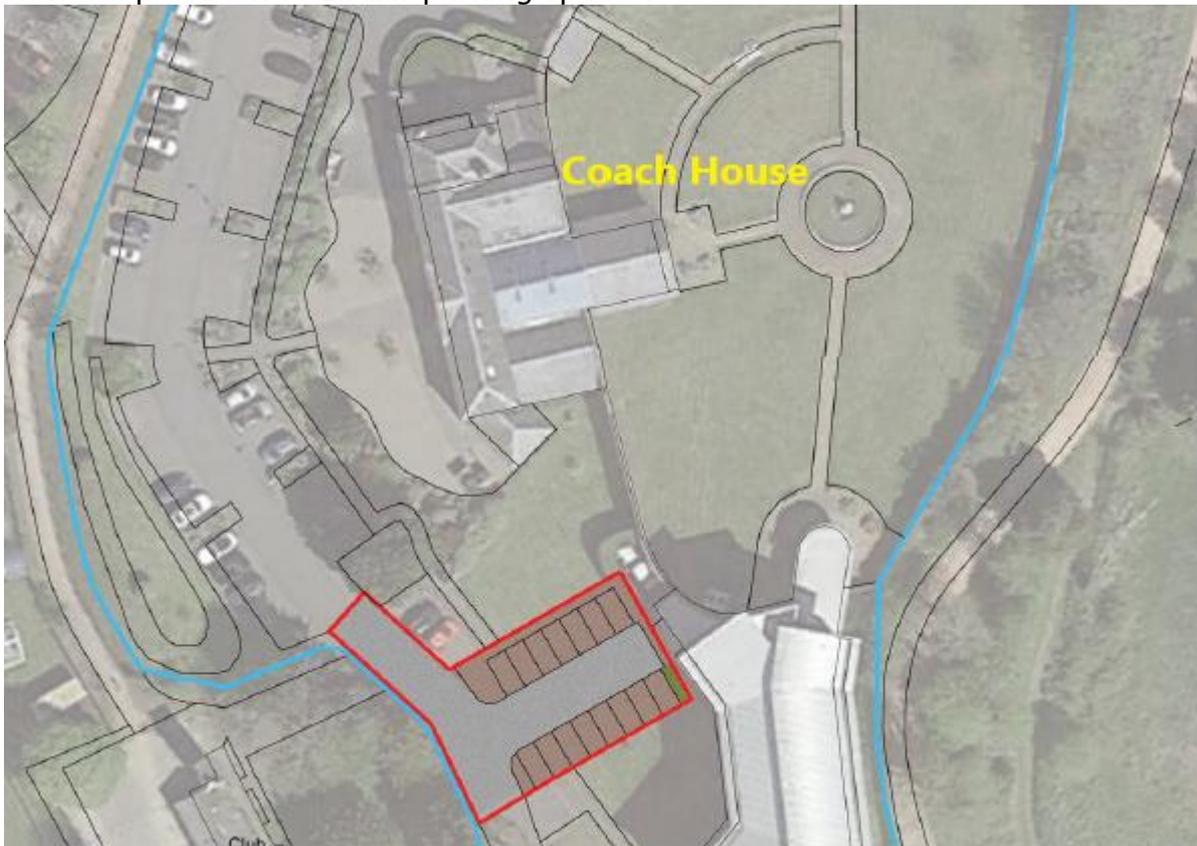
Proposed car parking to south of Grade II Listed Coach House
